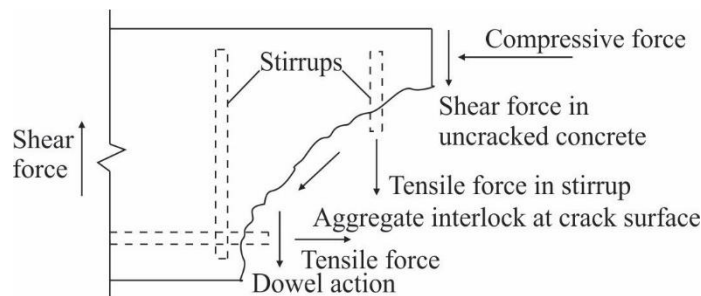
Internal forces in a cracked beam. Source: Kwan and Ng (2013).
